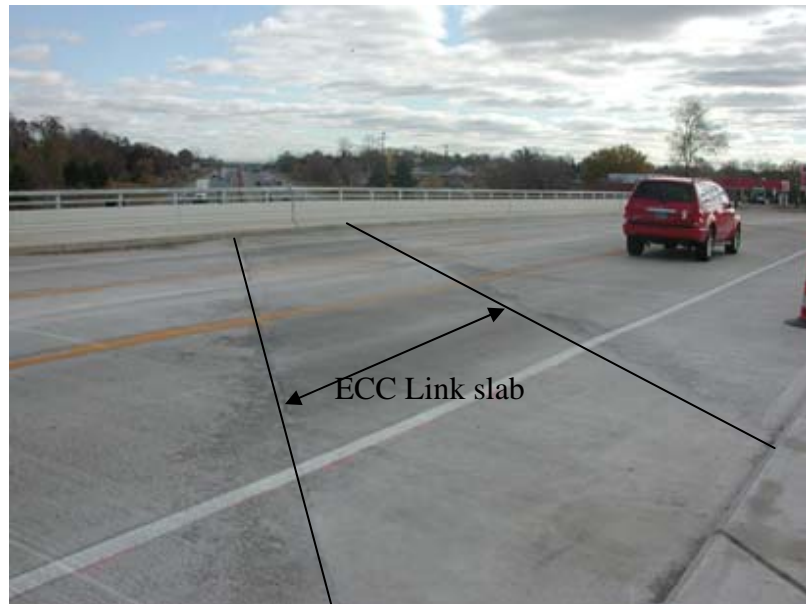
ECC link slab on the Grove Street Bridge over I-94 opened to traffic in October 2005, Michigan.
